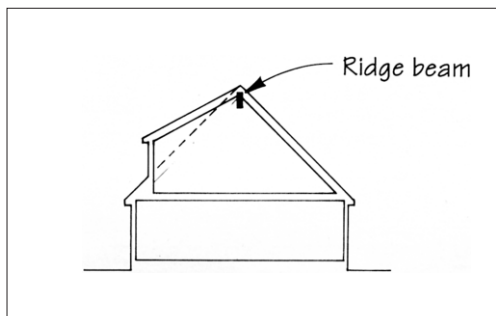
Hanging the dormer roof from a structural ridge beam adds space, saves money and time, and causes minimal aesthetic problems.
